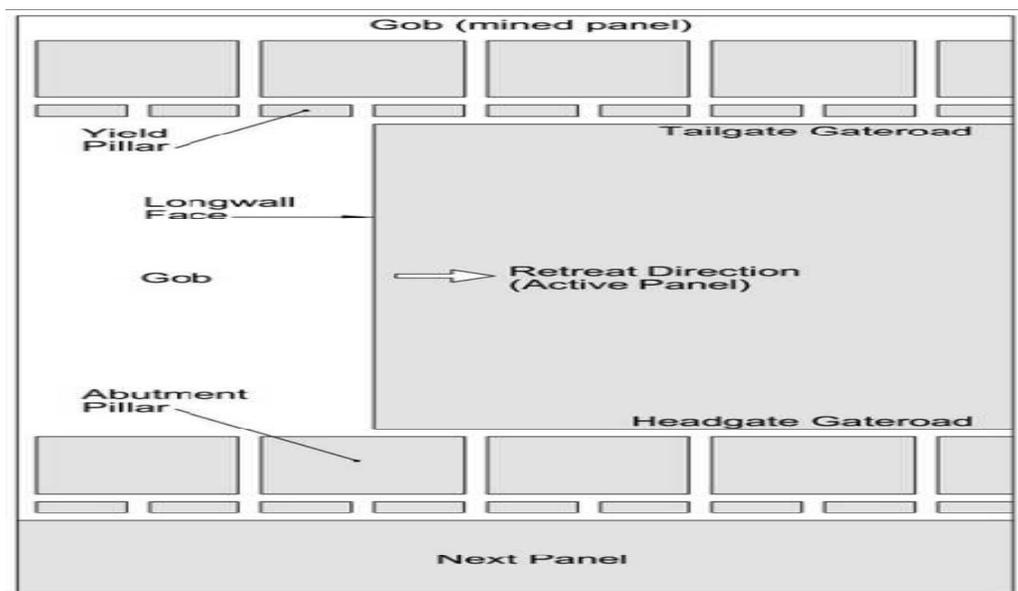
Plan of Three-entry Yield-abutment Pillar Gate road System with Side-by-side Longwall Panels. (Gilbride and Hardy, 2004)
